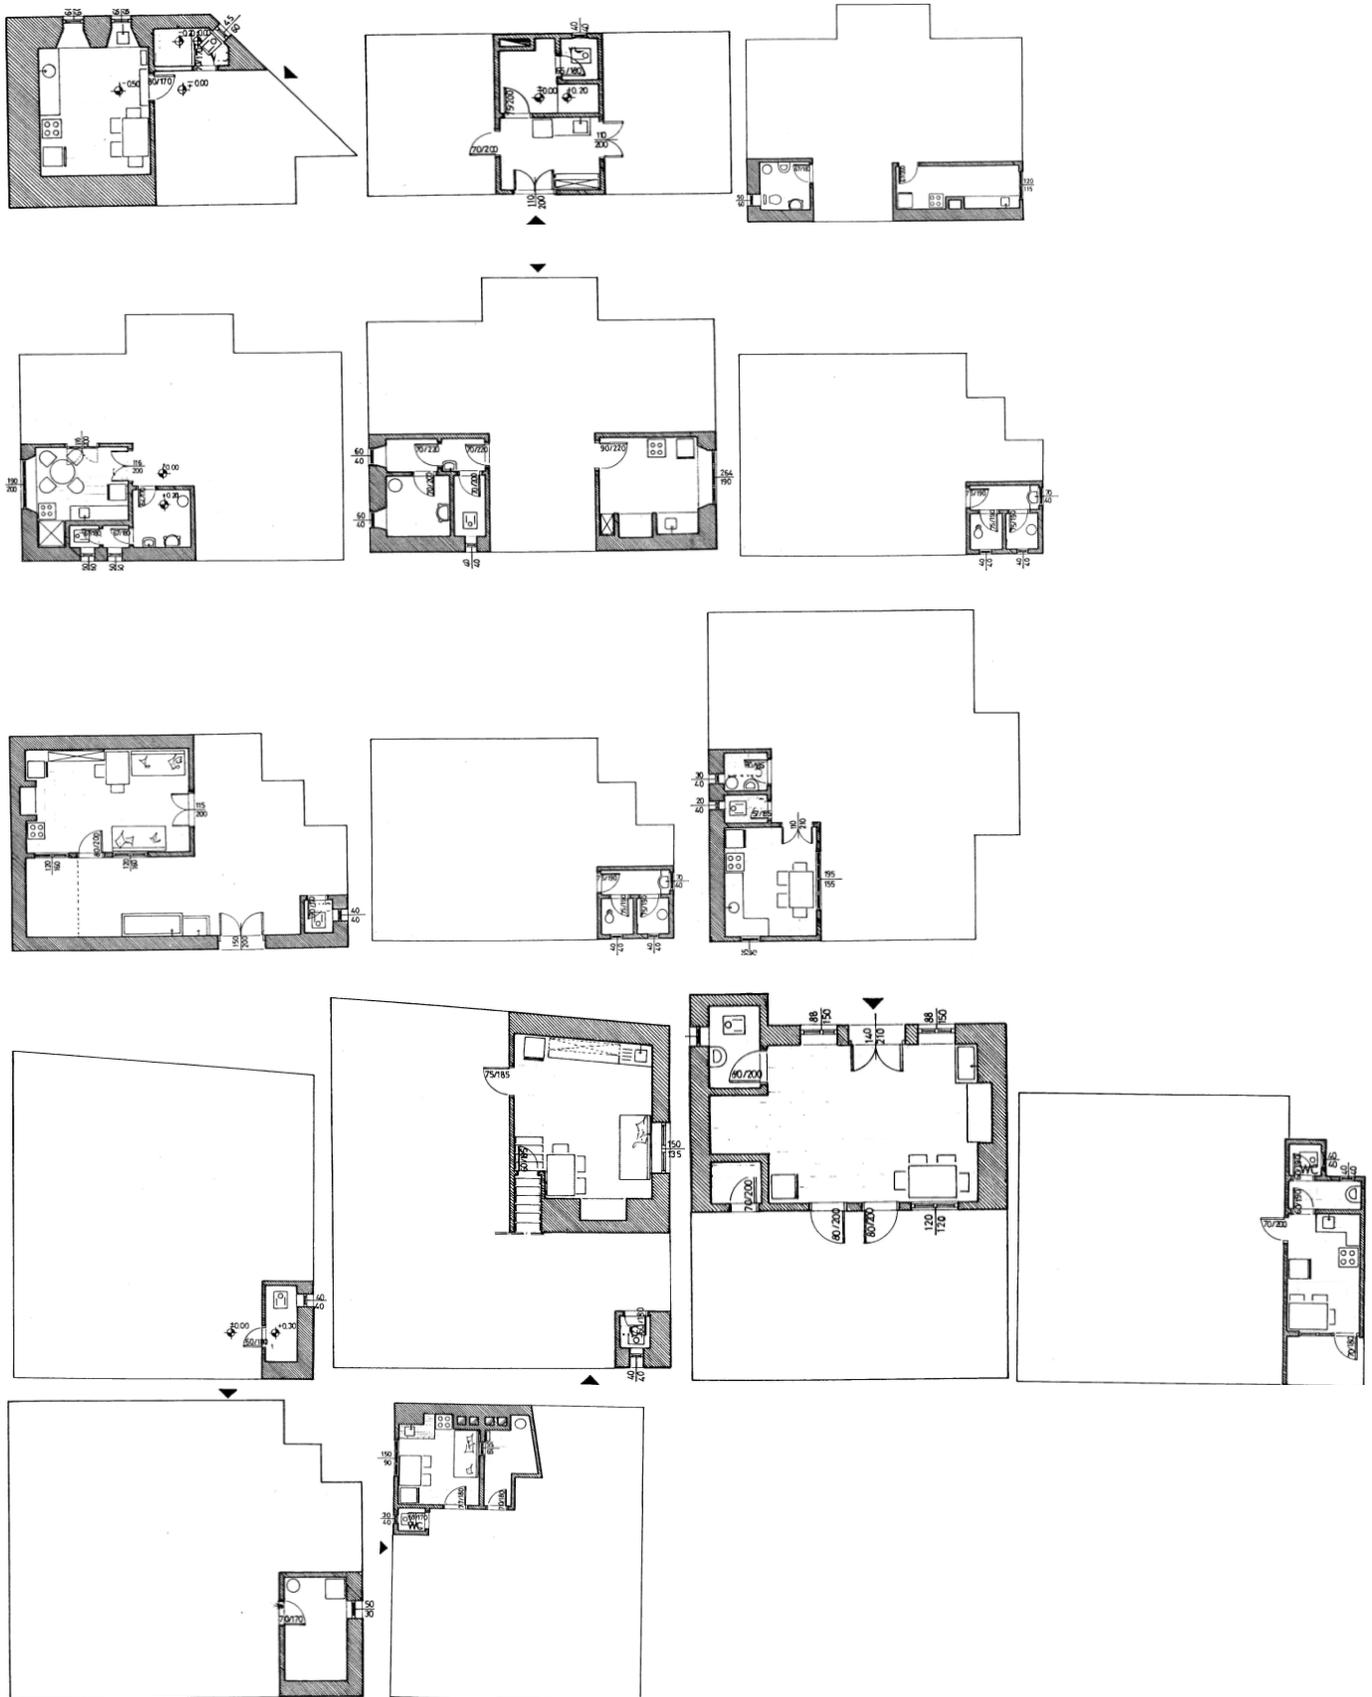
Plans of the building-sanitary equipment in the sample houses studied.
